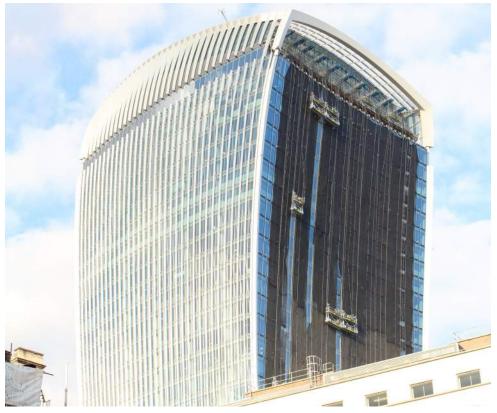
Photograph of a brise-soleil being installed on the "Walkie Talkie" building (20 Fenchruch) in London, UK. (Photo courtesy of Albert Brooks.)
